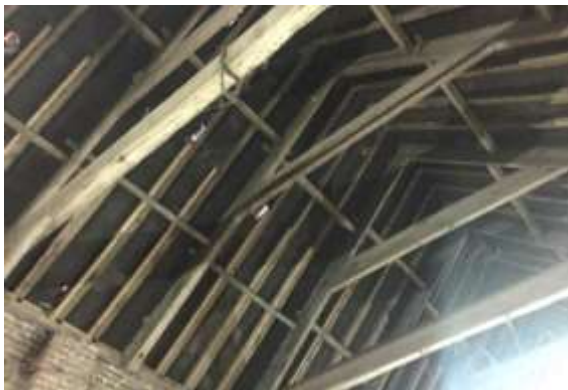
Roof structure showing trusses, tie bars and rafter strengthening
